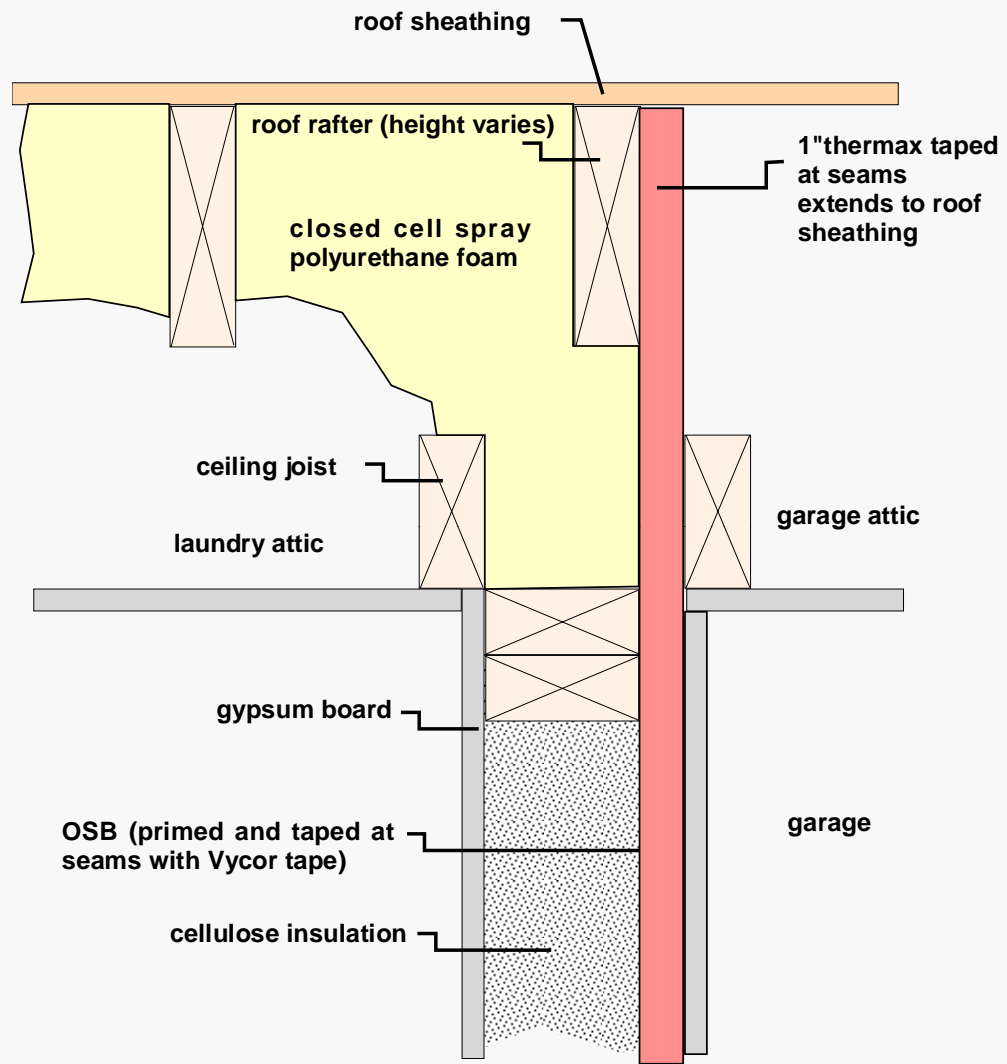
Detail of laundry room/garage wall, laundry room attic and insulated laundry roof.
